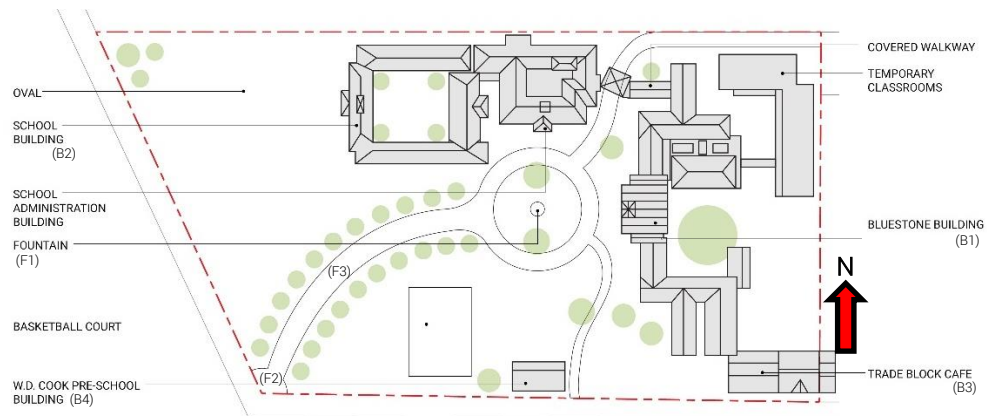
Site diagram showing the buildings and main features of the subject site. Source: NBRS, 2022
